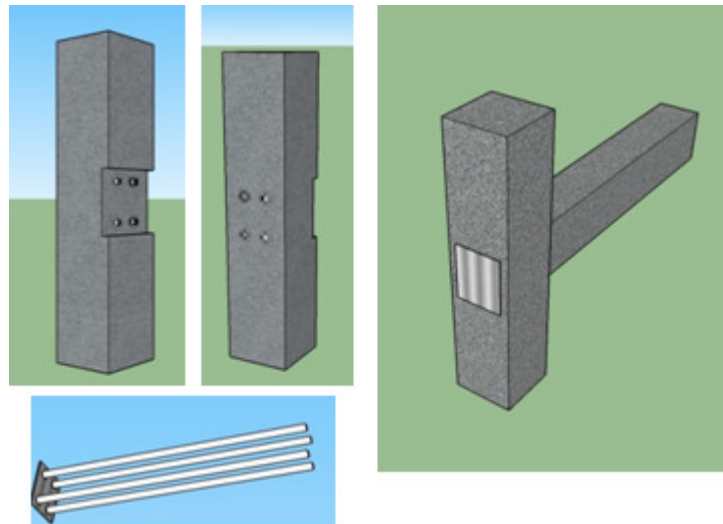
Illustration of making non-monolith beam-column joint test specimens
